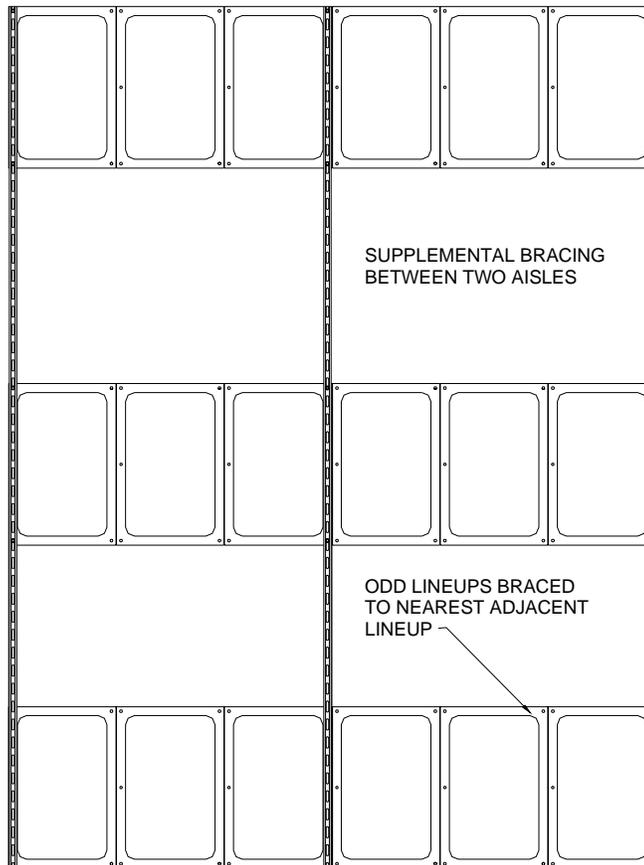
Equipment Framework Secured To Heavy Duty Access Floor
